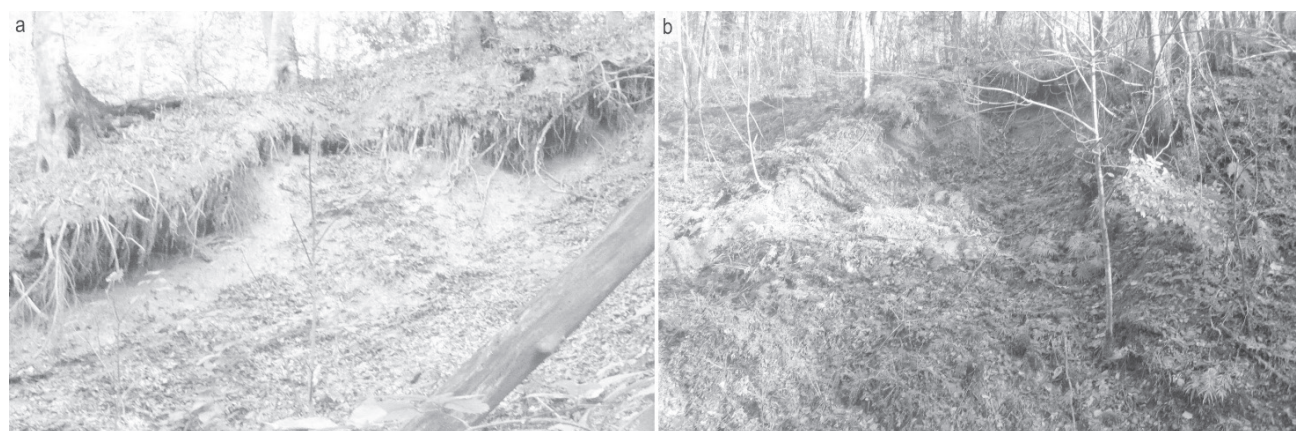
A natural shallow landslide; lateral root reinforcement can be seen along the tension crack (a) and failure of forest road cut slope (b) in the study area
